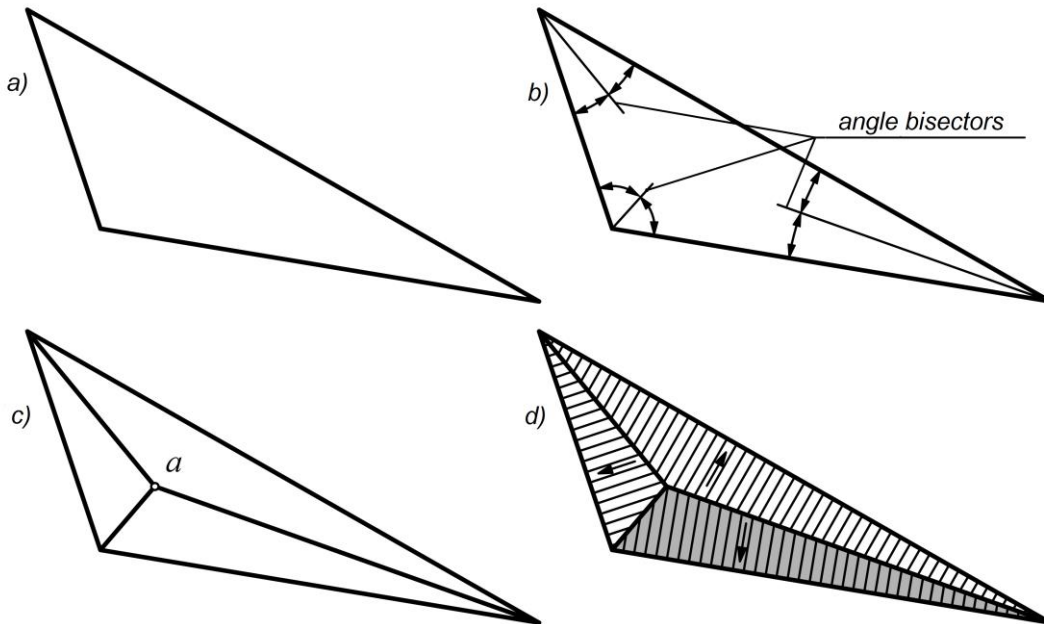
Construction of projections of slope intersection lines for a triangular-shaped roof
